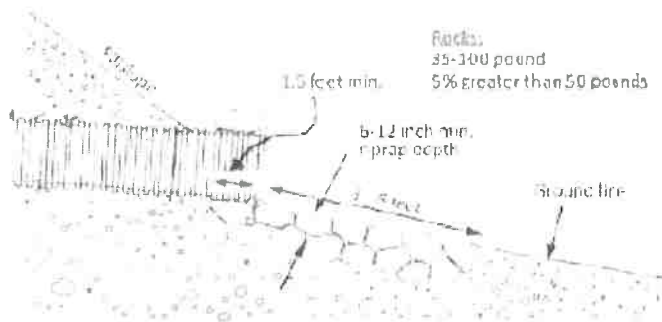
A. Riprap armor at culvert outlet (Modified from Kohler et al., 2011).
